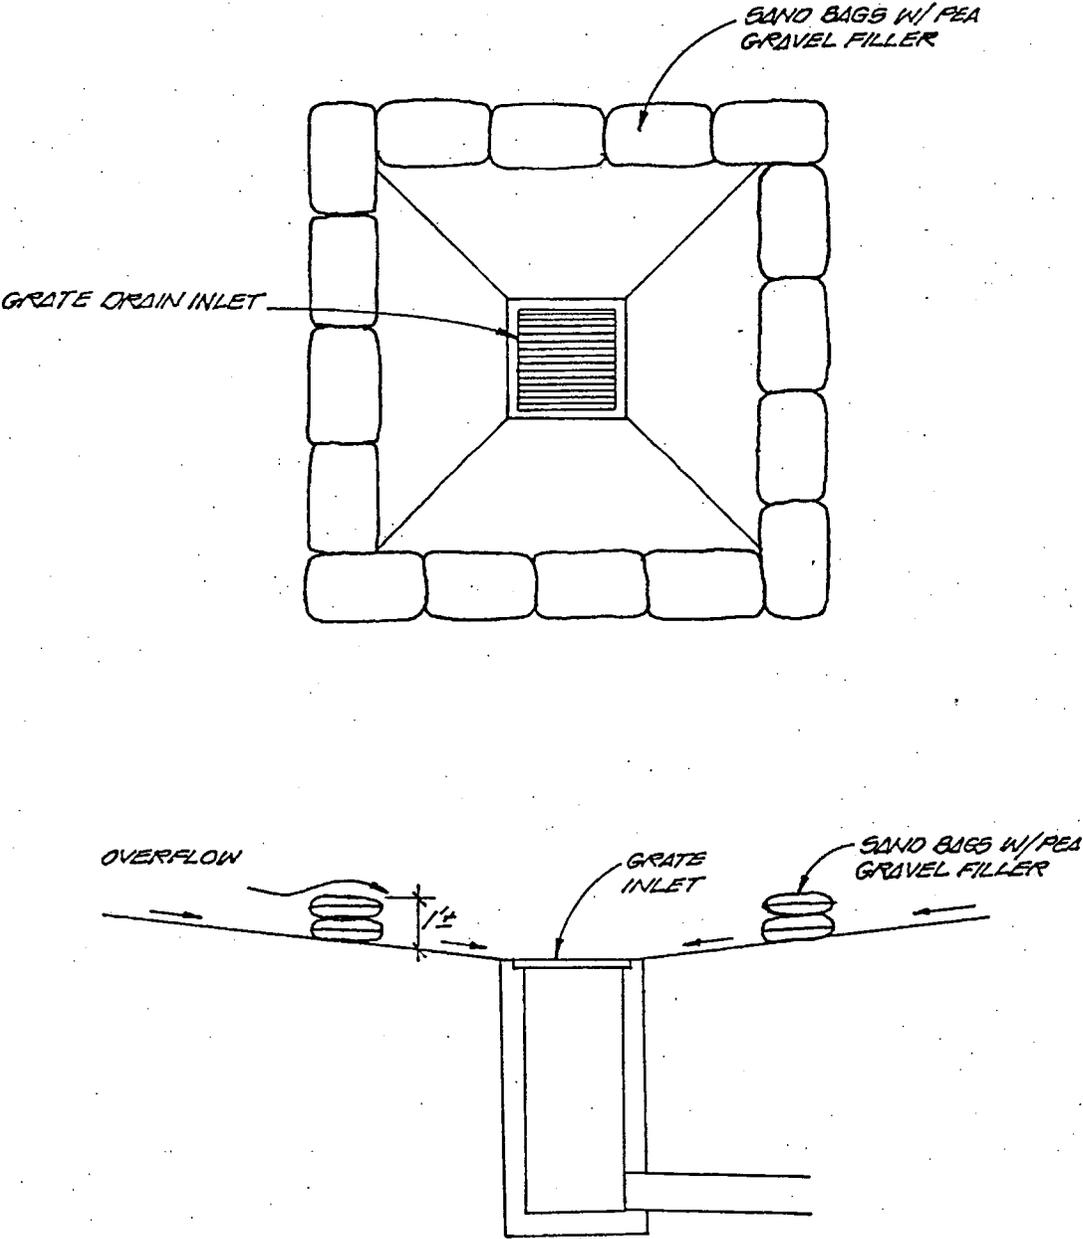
Diagram of Bagged Gravel Grate Inlet Protection (Pape-Dawson)
